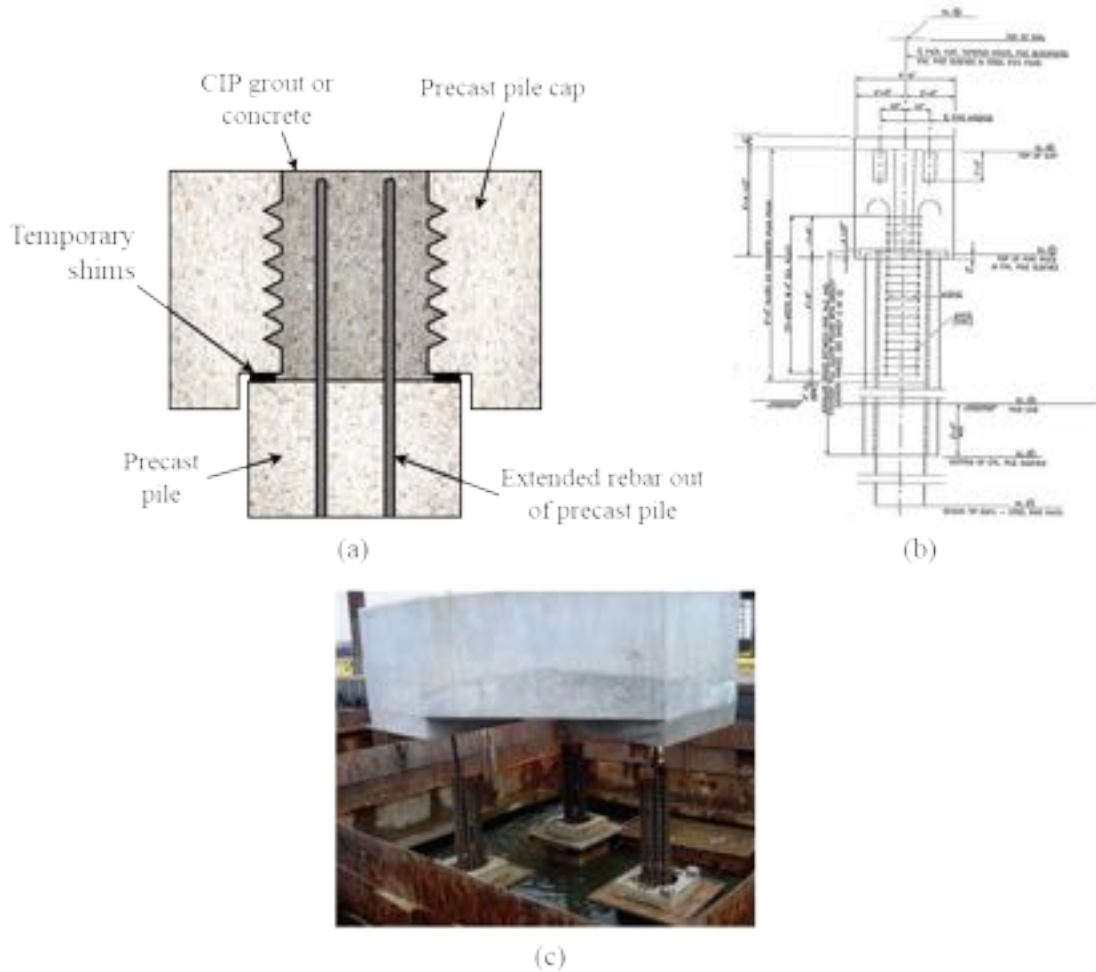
Examples of Pocket Connection between pile cap and pile: (a) connection between two precast elements; (b) connection use in Beaufort and Morehead Railroad Trestle Bridge(North Carolina Department of Transportation, 1999); (c) connection use in I-10 Bridge over Escambia Bay(Rudie et al., 2008).
